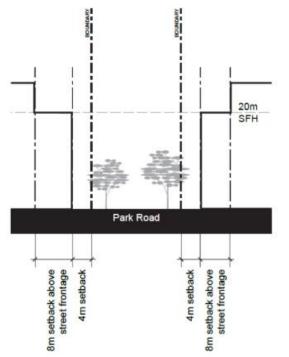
Park Road setback requirements (Source: Draft DCP – Parramatta Road Precinct)
